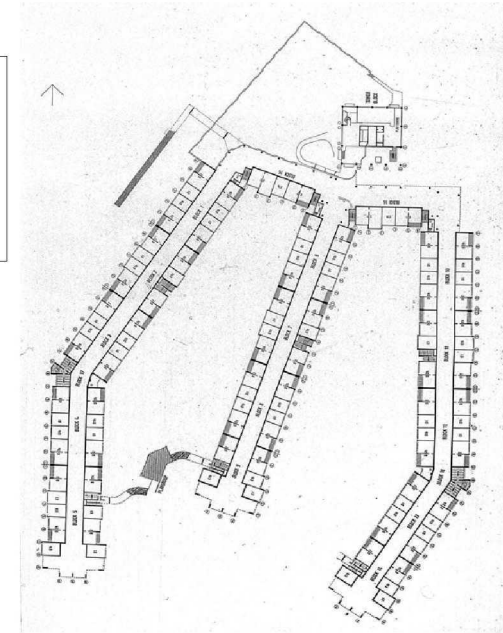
Original drawing - Lower Ground Floor of Lancaster West
